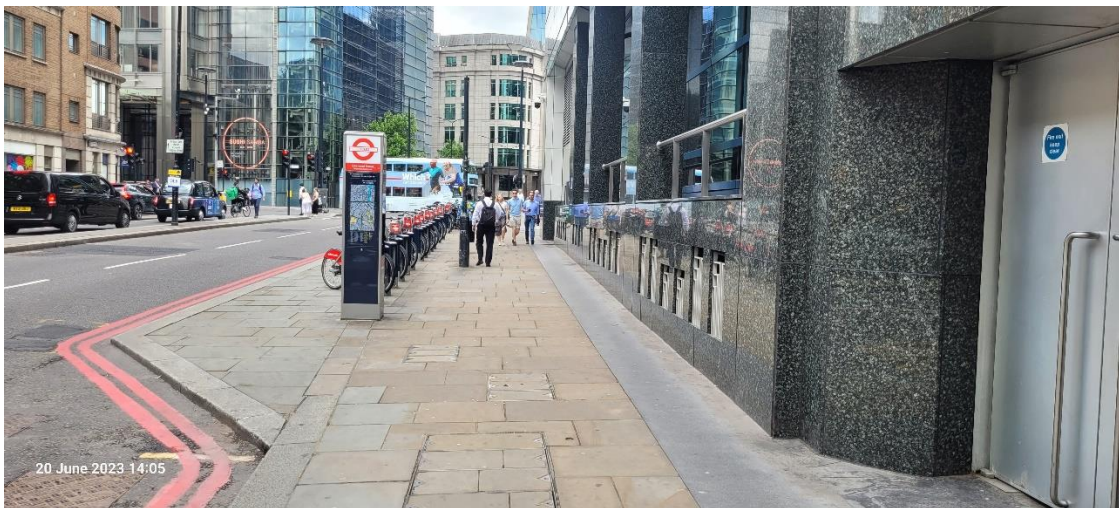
Existing pavement widths to north elevation (Wormwood Street)
